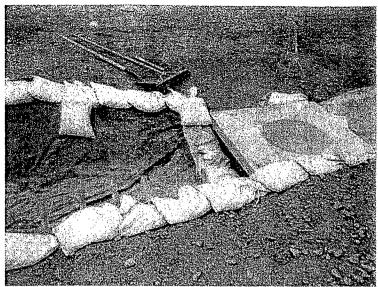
Inlet with gravel bag protection. NOV photo 38.
